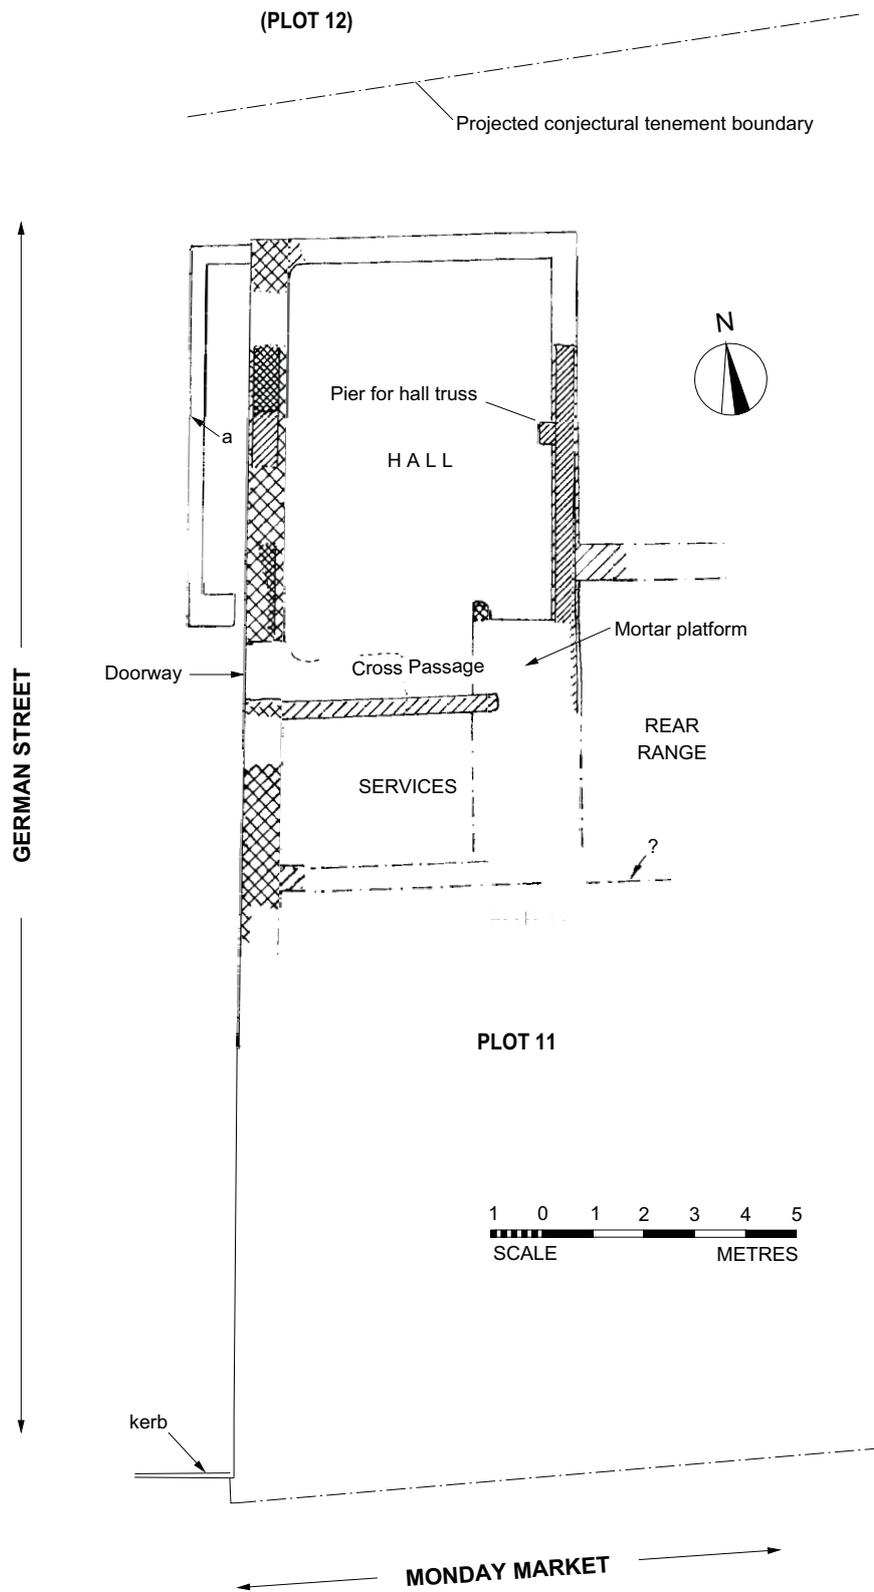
German Street, 1974. Plan of the phase-II building
